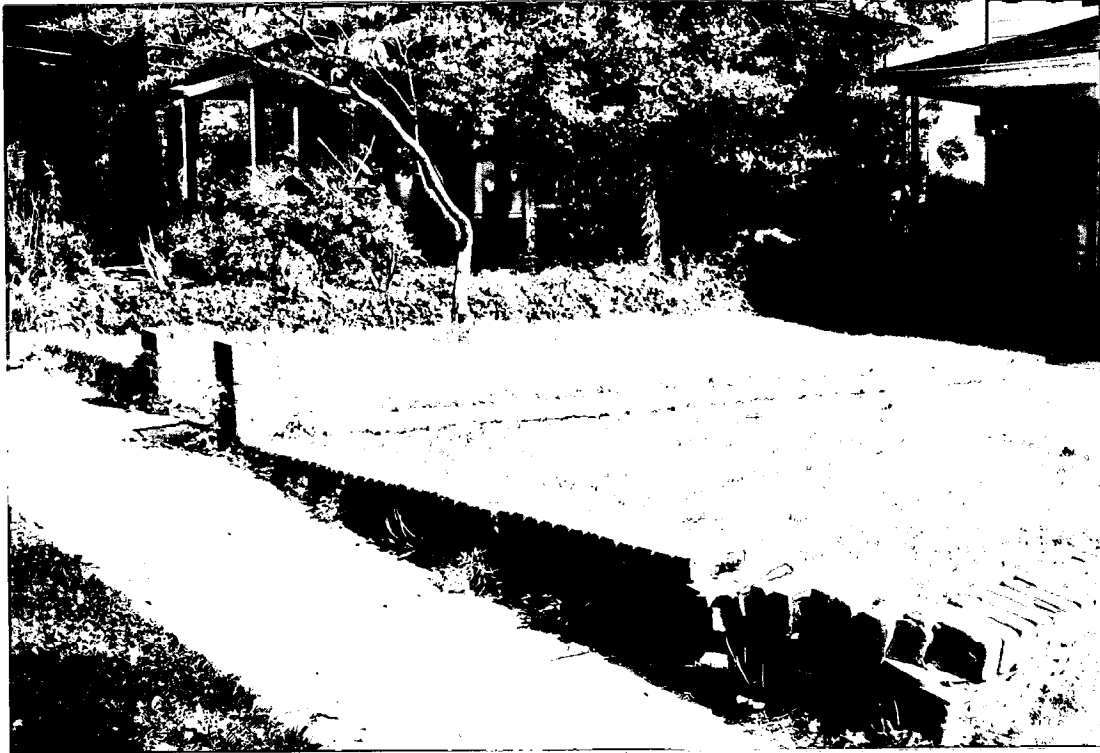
Tulip Ave: BRICK WALL ON FRONT OF HOUSE
